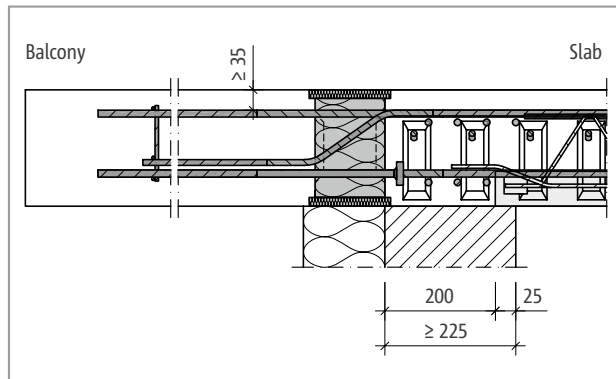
Schöck Isokorb® XT type C: Prefabricated slab without edge support with TICS (section XT type C-L-CV35, view XT type C-R-CV50)
